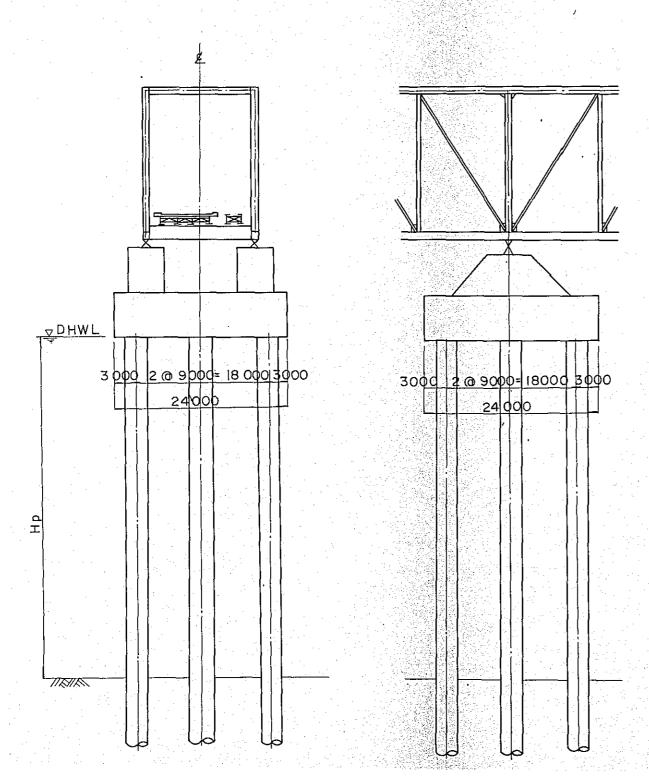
Outline of structure of multi-pile foundation ø 3.0 m
